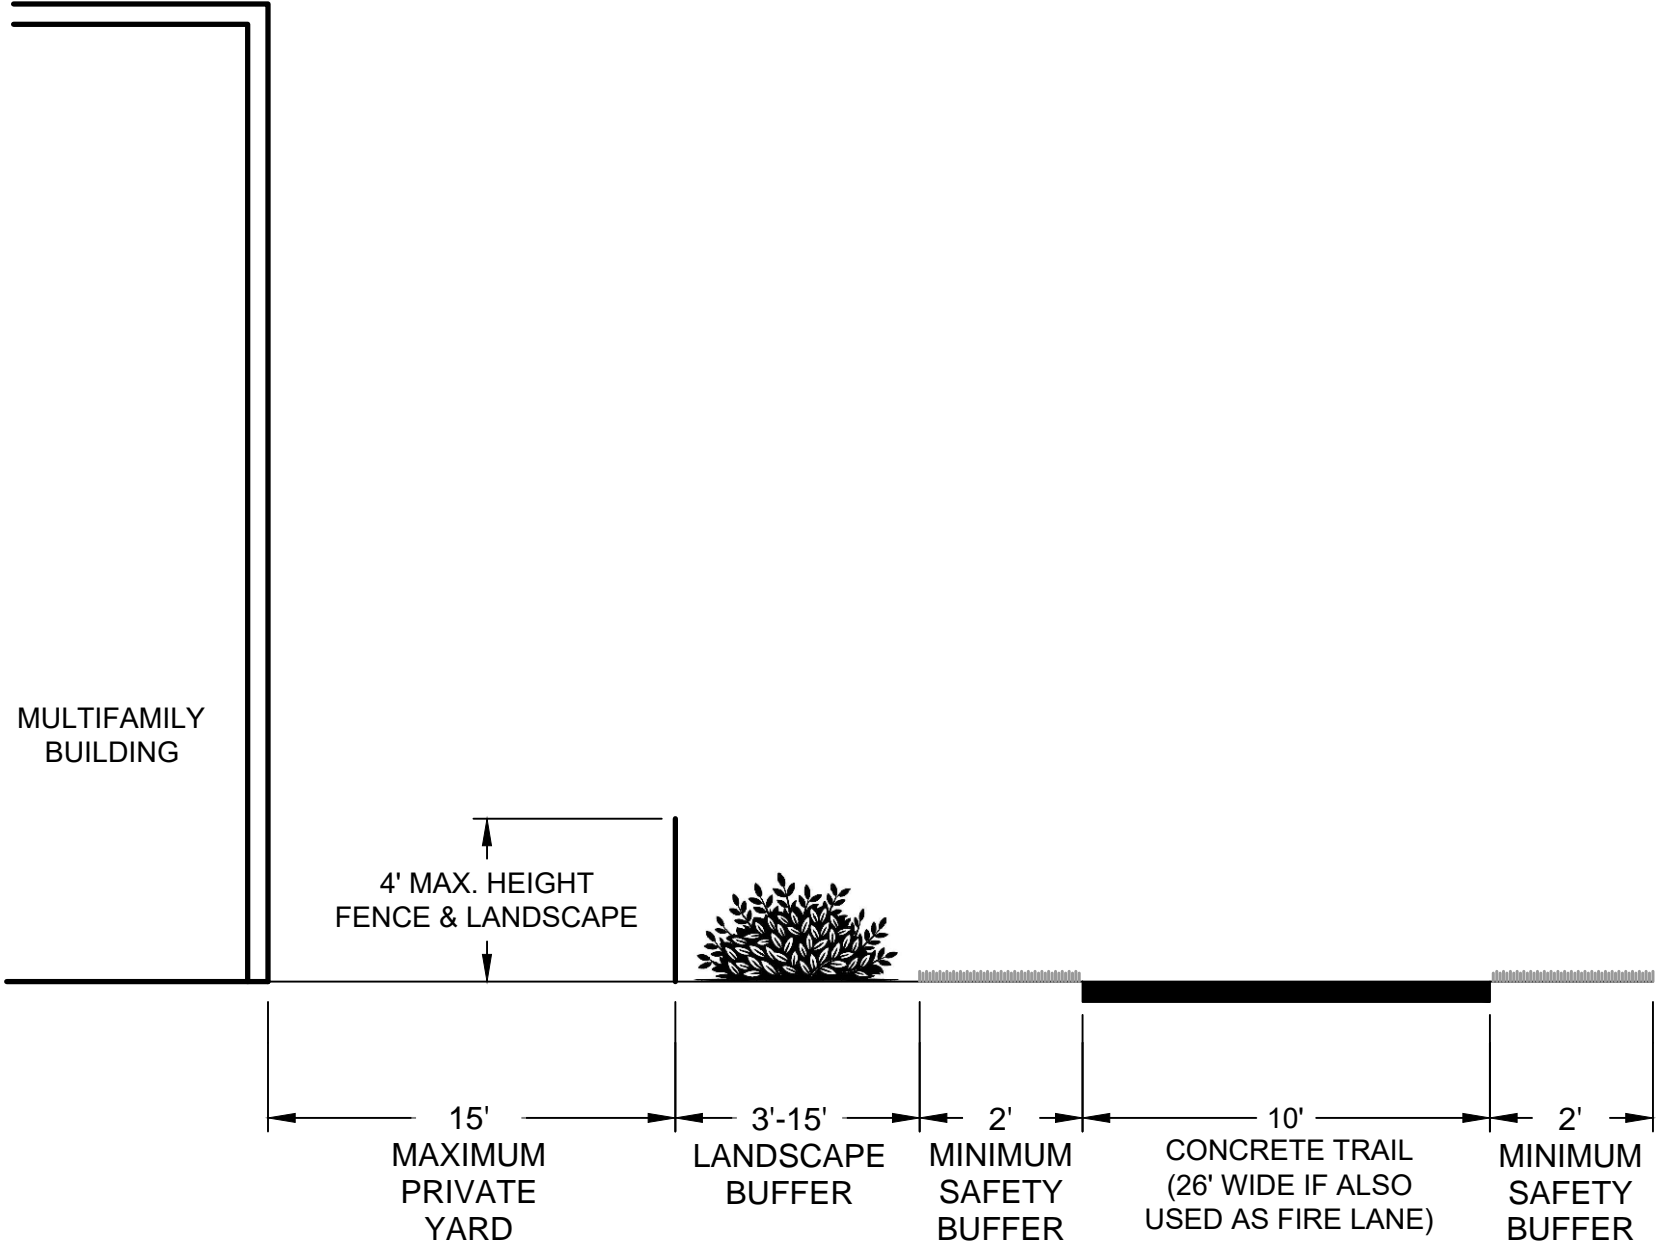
EXHIBIT G: MULTIFAMILY/ RELOCATED BRUSHY CREEK TRAIL INTERFACE SECTION
